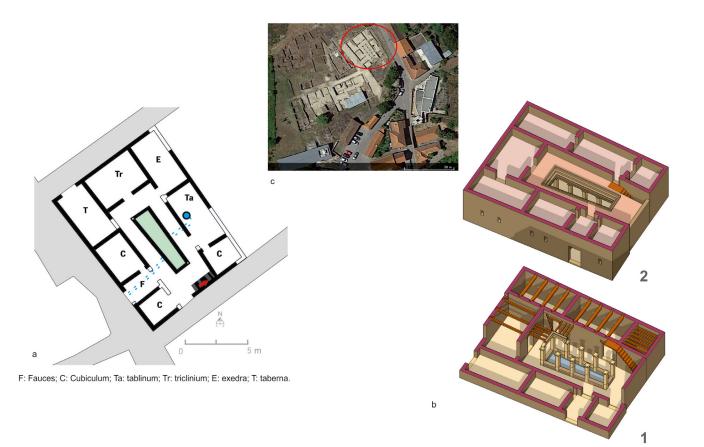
a. Plan of the 'Well House' 'Casa do Poço'. b. 3D model of the 'Well House' (3D modelling software - SketchUp2018). 1. Detail of the wooden beams to support the roofs of the 1st floor and of the *ambulacrum* 2. plan of the house at 1st floor level. Author's drawing. c. Detail of the ruins of the 'Well House' ©Google Earth.
